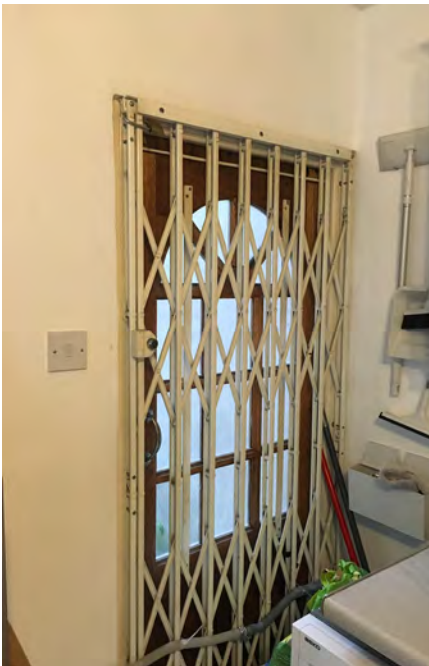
Ground Floor Internal view of the door in the closet wing extension looking out onto the side alley
